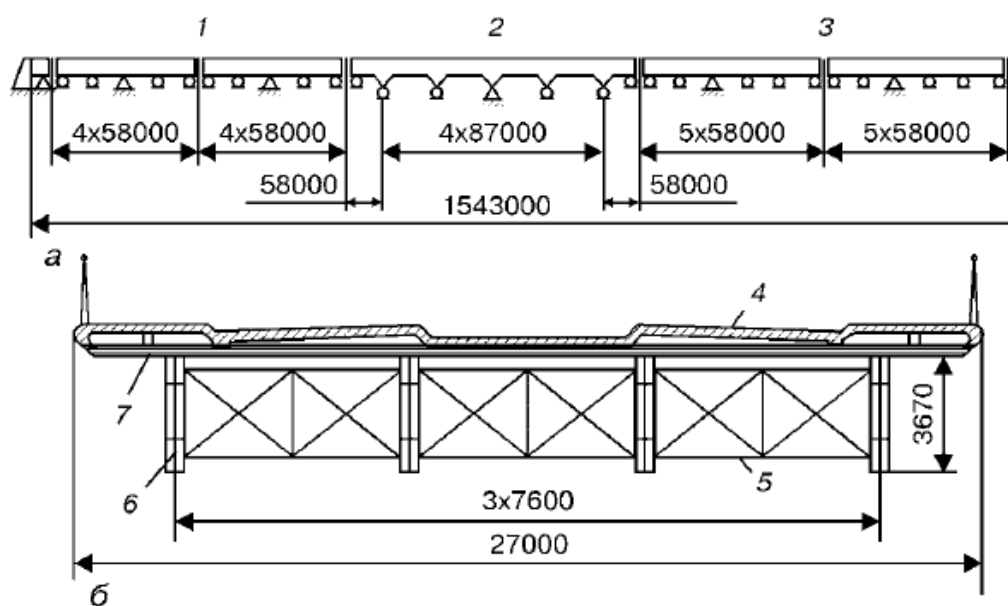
General scheme (a) and cross section (b) of the Evgeny Paton Bridge across the Dnipro river in Kyiv: 1 - left-bank area (two continuous four-span stiffening beams); 2 - middle area (the same, one six-span girder); 3 - right-bank area (the same, two six-span girders); 4 - reinforced-concrete plate of passageway; 5 - transverse braces between principal beams; 6 - principal welded I-beam with a solid wall; 7 - transverse rolled I-beam (Lobanov, Kyrian, & Shumitsky, 2003).
